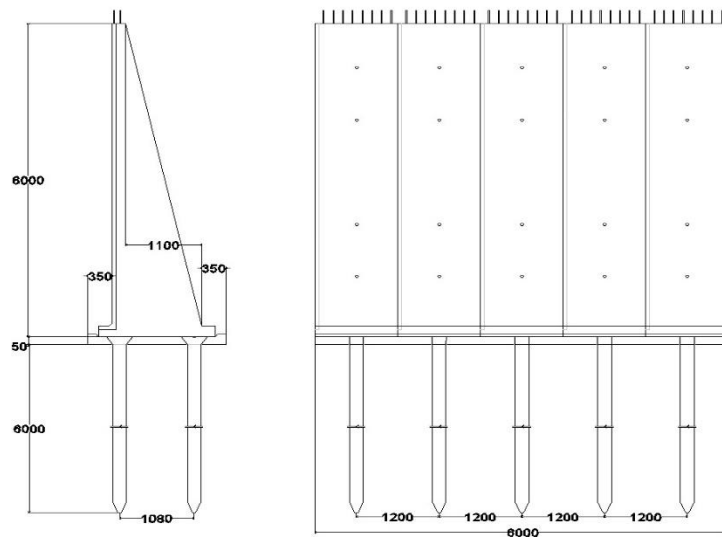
T-Shape Gutter Wall (Side View and Front View)
